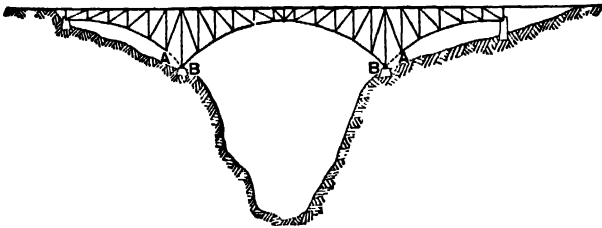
Layout of Arch Span with Arch-like, Simple-truss, Flanking Spans.
